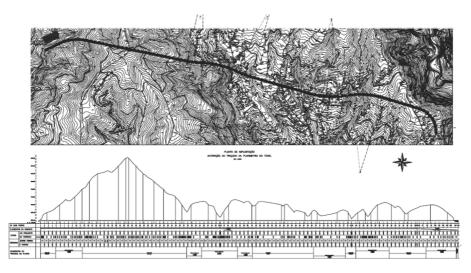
Plan and longitudinal cross section of Covão tunnel (Cafofo and Sousa 2007)
